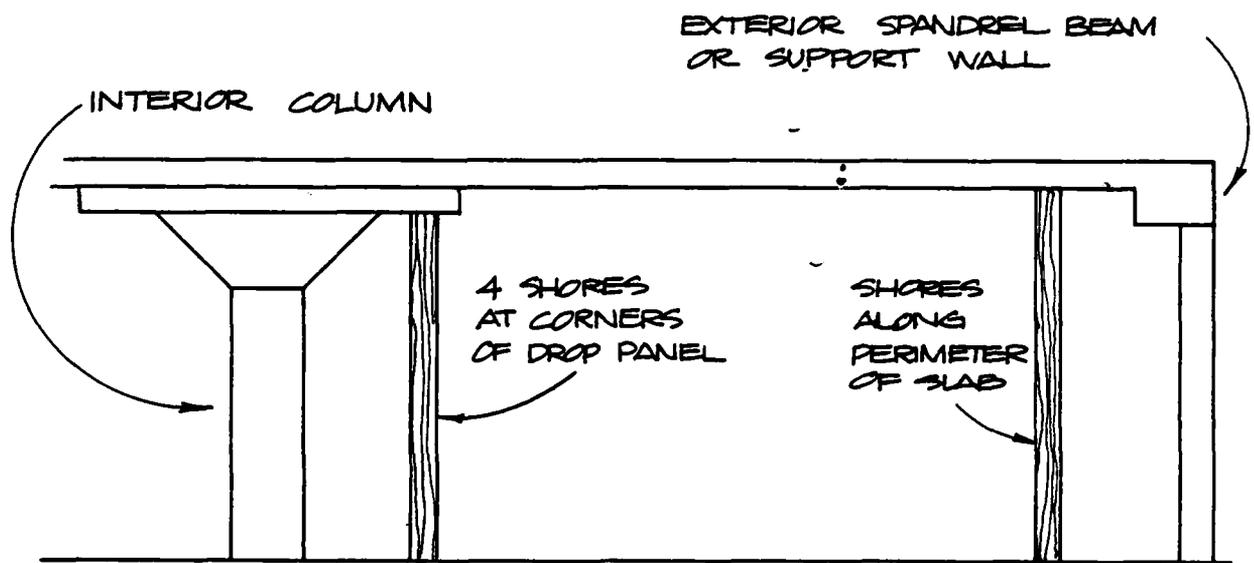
Shoring System for Prevention of Localized Early Failure.
